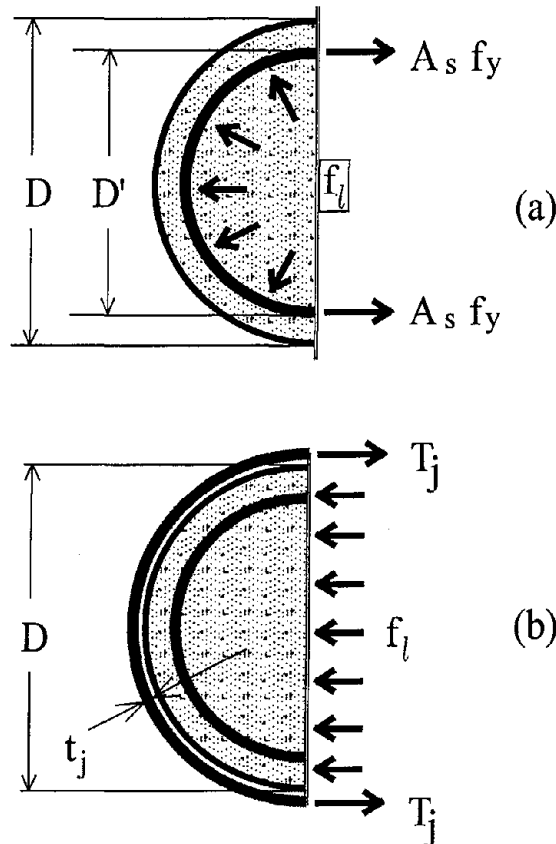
Confinement of concrete column using : (a) steel hoops and (b) FRP composite jacket
